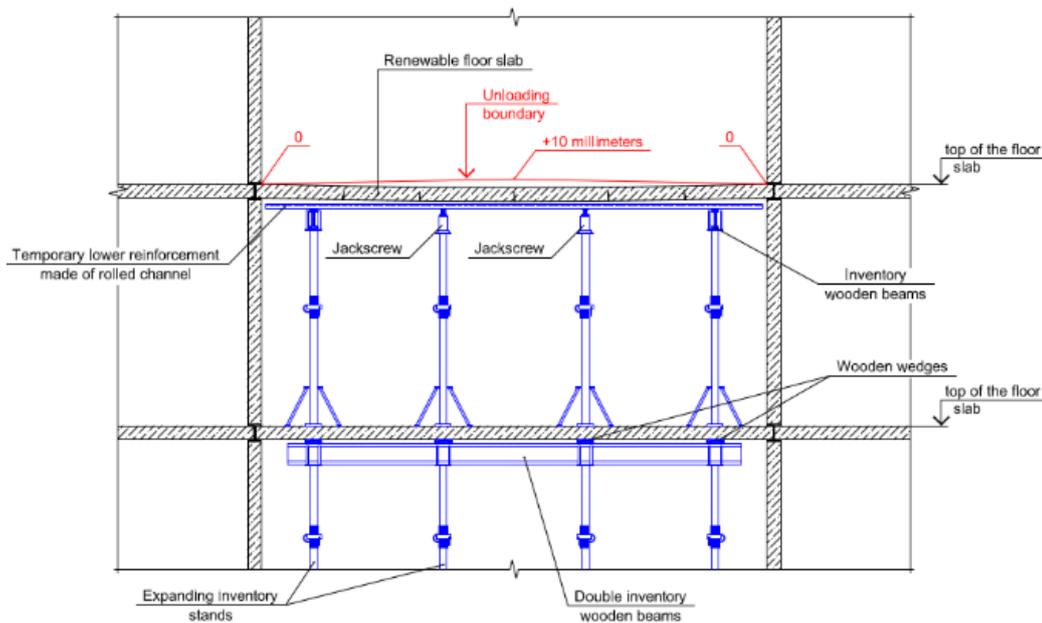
Scheme of slab unloading and leveling (lifting the slab by 10 mm using jacks).
